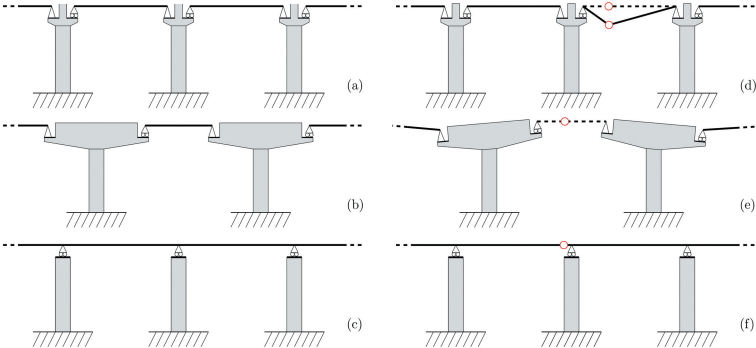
(a-c) Sketches of typical beam arrangements in existing concrete bridges and (d-f) effects of the formation of a hinge in the deck beams, from De Biagi et al. (2022).
